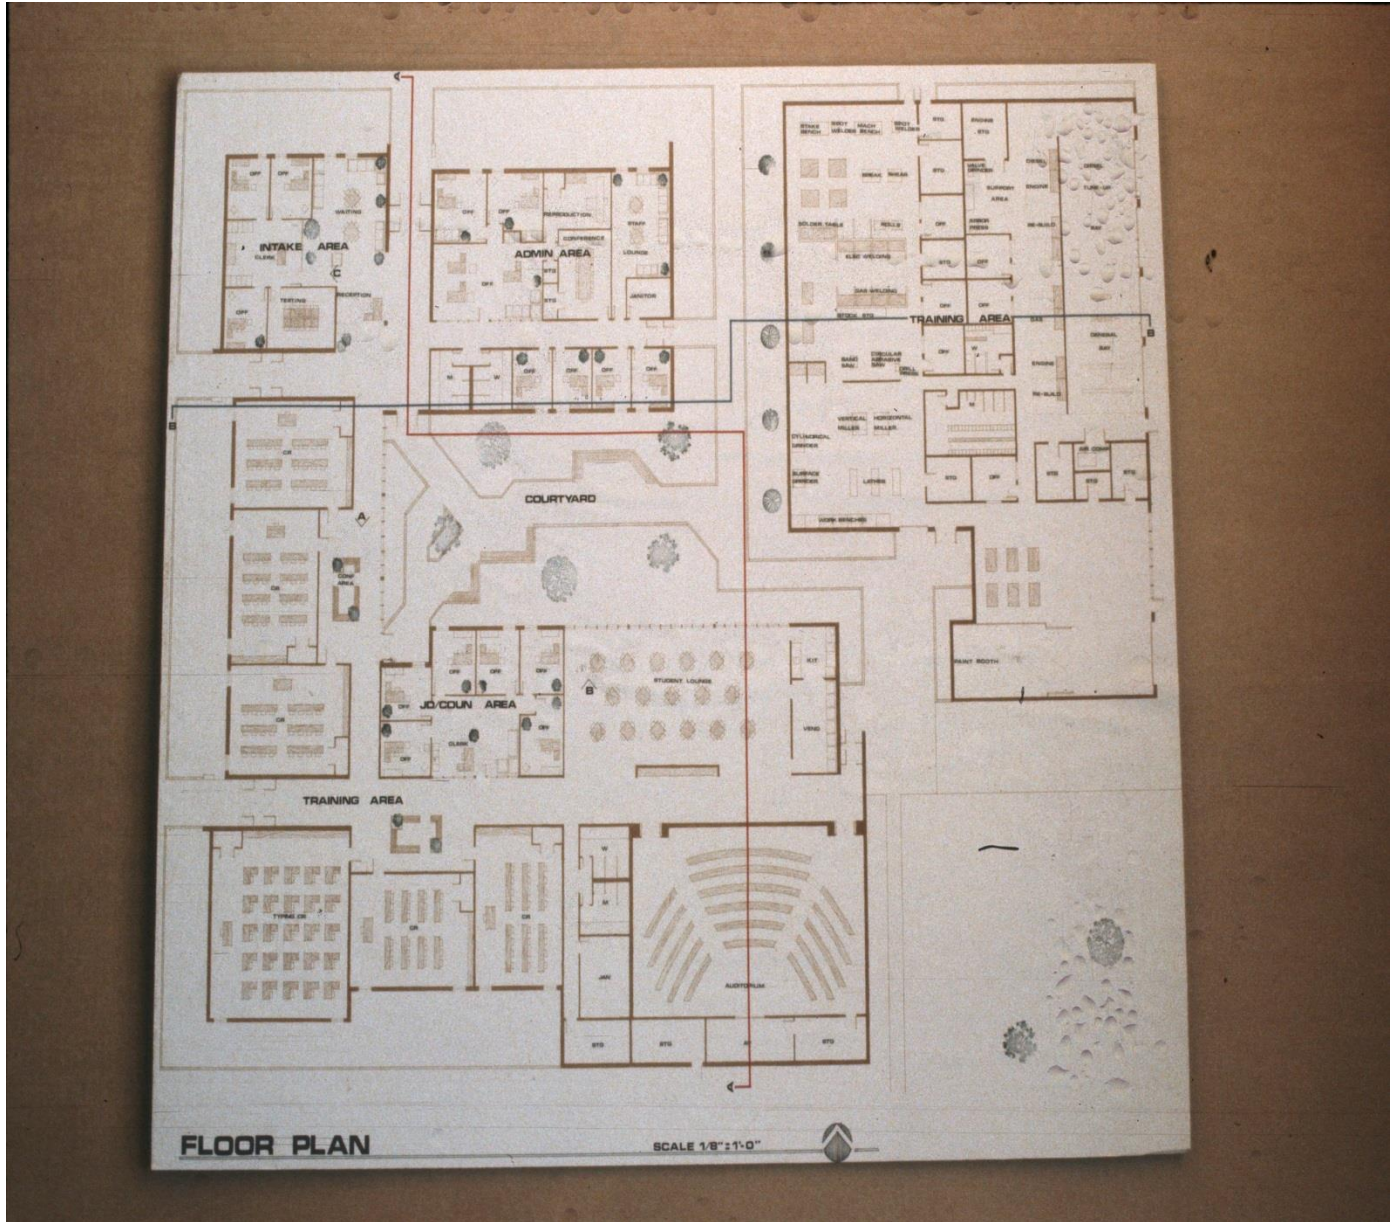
7: Floor plan layout of proposed entrepreneurship centres
